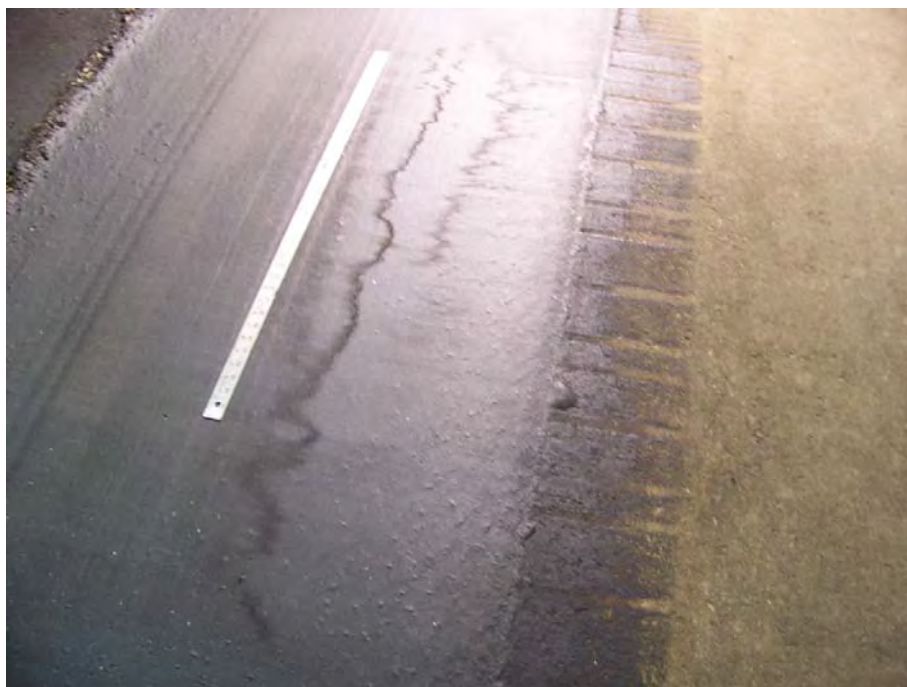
Longitudinal Crack on KS2-4 Section at 1,400,000 Load Cycles
